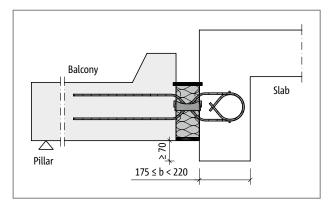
Schöck Isokorb® T type Q-E-W-VV: Installation situation "pre-cast balcony slab" (e.g. T type Q-E-W-VV1 to VV3)
